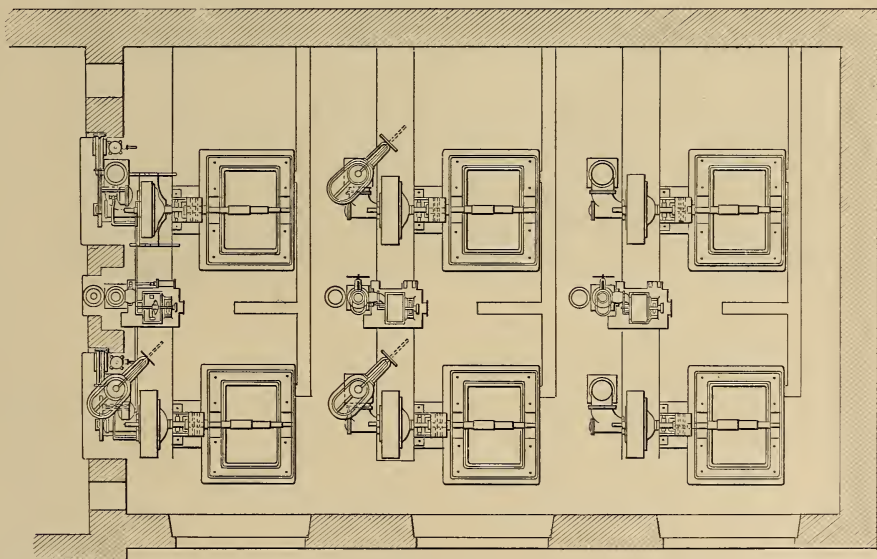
FIG. II.—A PLAN OF THE HYDRAULIC POWER HOUSE AT TIVOLI
